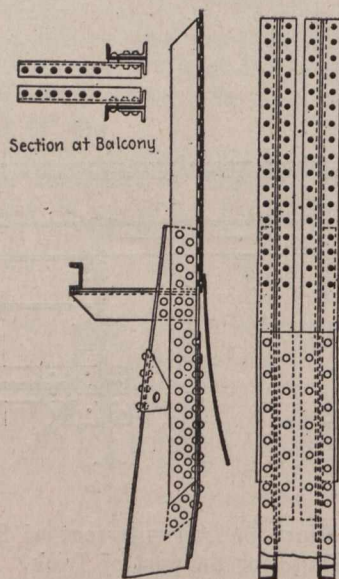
Detail of Attachment of Tank Shell to Tower Post and Circular Girder Construction.
